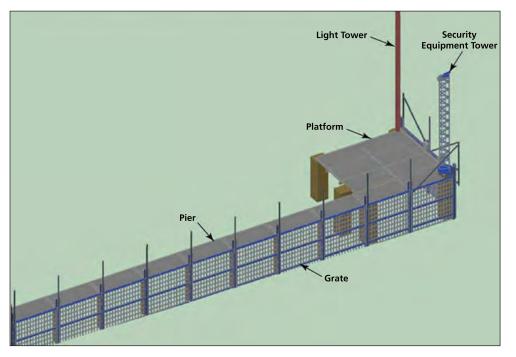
Side view of the Pile-Supported Piers and Port Security Barrier Modifications Alternative 2.
